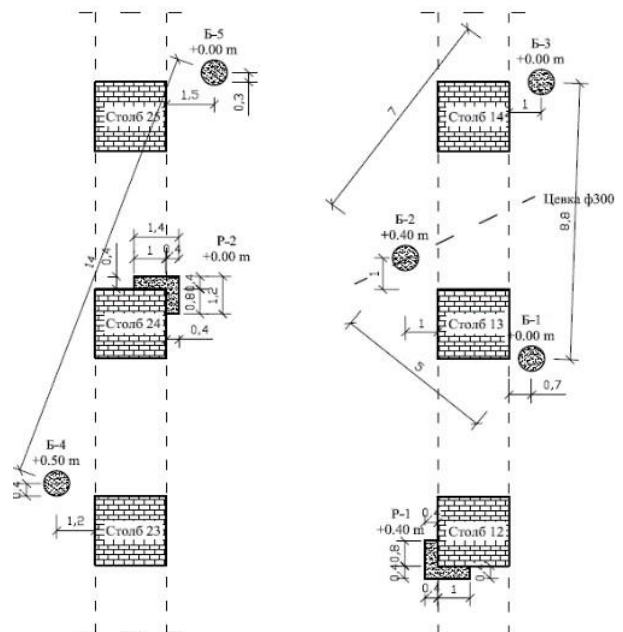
Additional geotechnical works (wells and trenches) conducted in 2019 in vicinity of the most inclined piers: for piers 23-25 (left) and for piers 12-14 (right).
